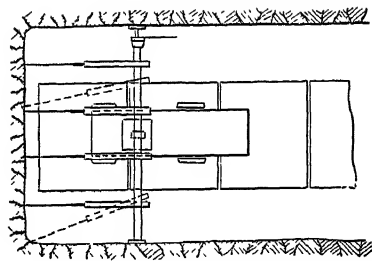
HORIZONTAL ADJUSTMENT OF DRILLS.
